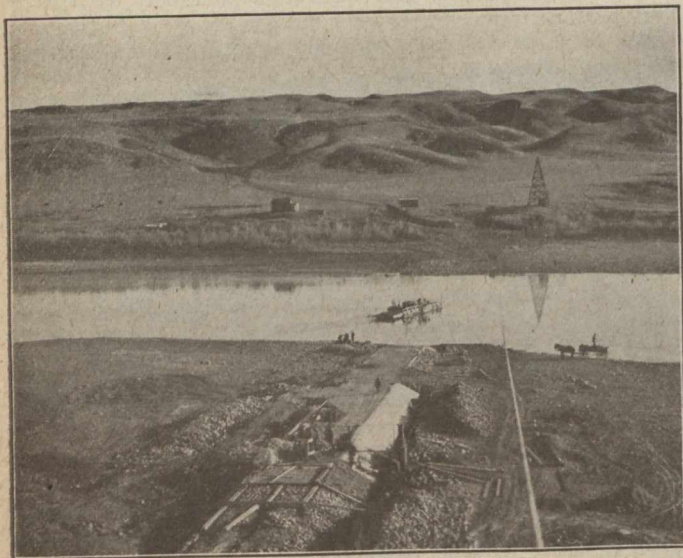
CONSTRUCTING PERMANENT APPROACH TO FERRY
